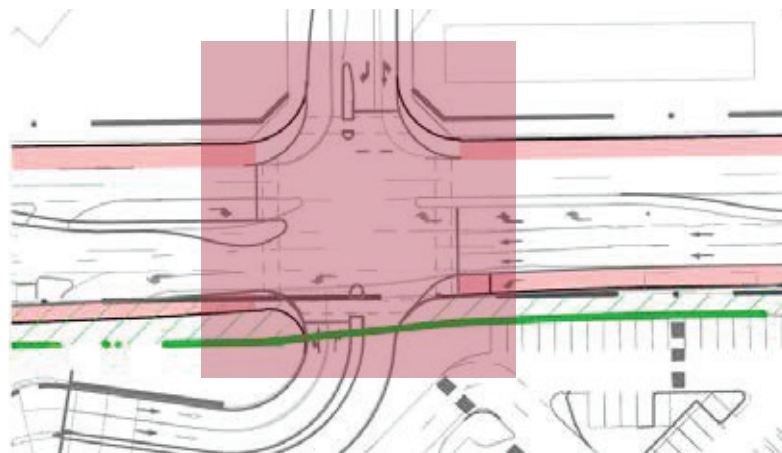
Walter Road West/Wheeler Street - Modelled Scenario
